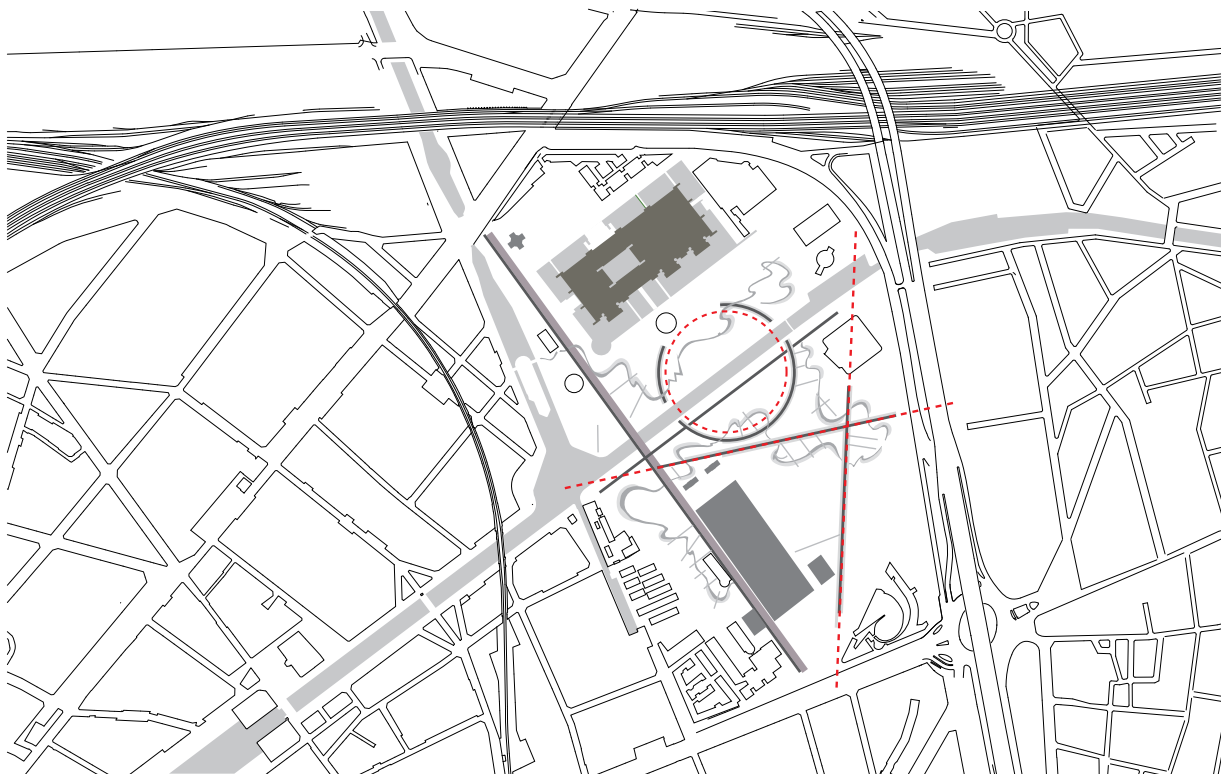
Plan configuration allées. (Drawing: Tim Peeters & Author).
